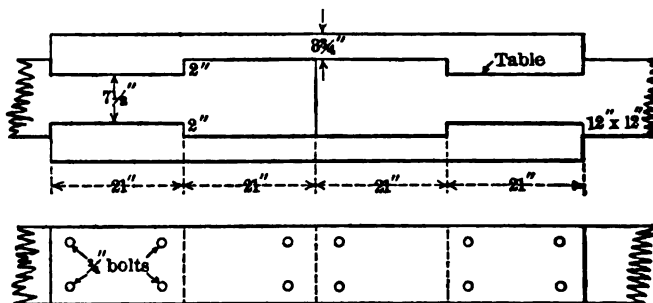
A. Alternate Detail for Splice of Bottom Chord
